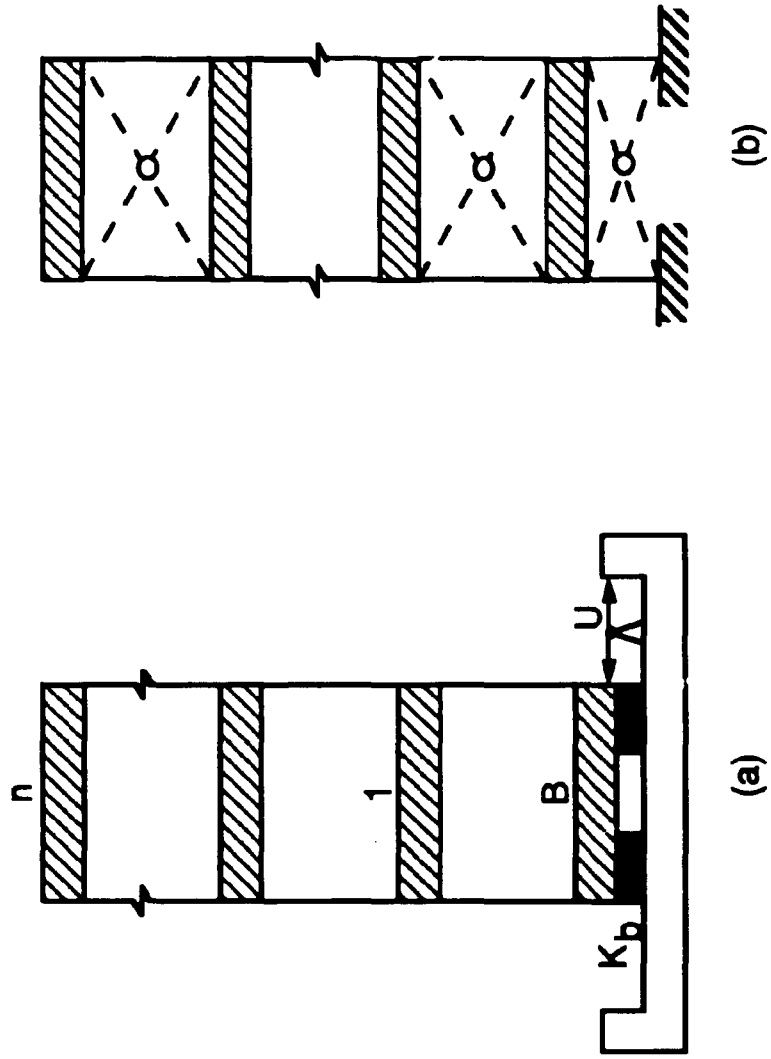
Structural Model of a Multi-Story Building : (a) With Rubber Bearing Isolation System and Actuator ; (b) With Active Bracing System
